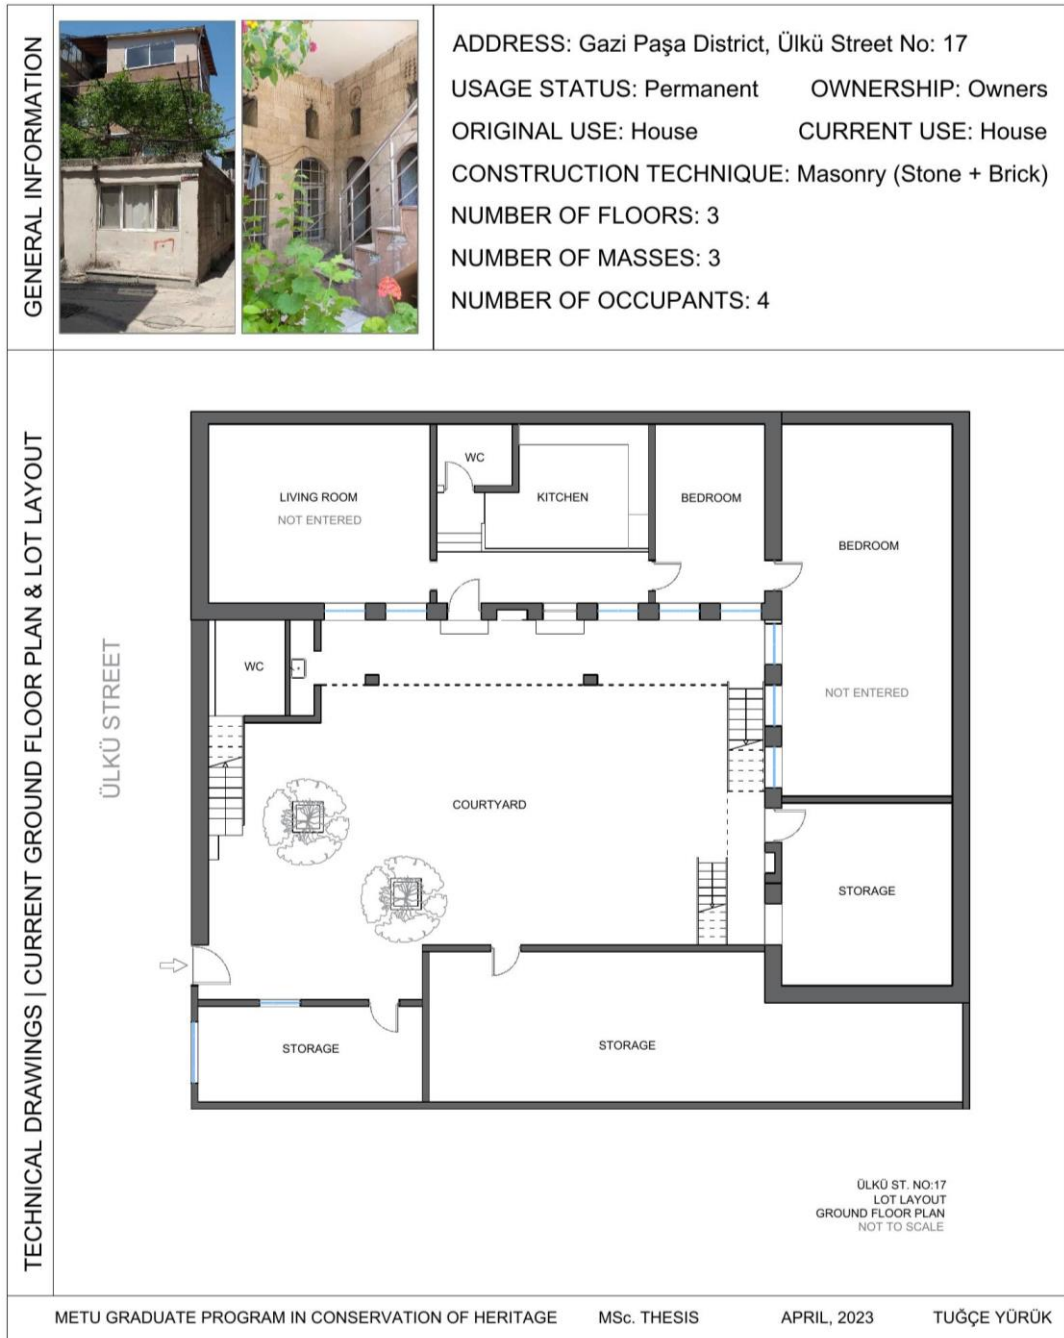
Current ground floor plan of the Ülkü-17 House (Author, 2023)
